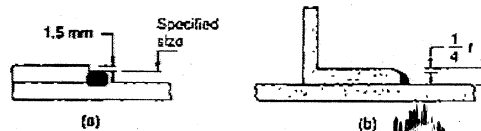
Fillet weld on square edge and round toe of a section
